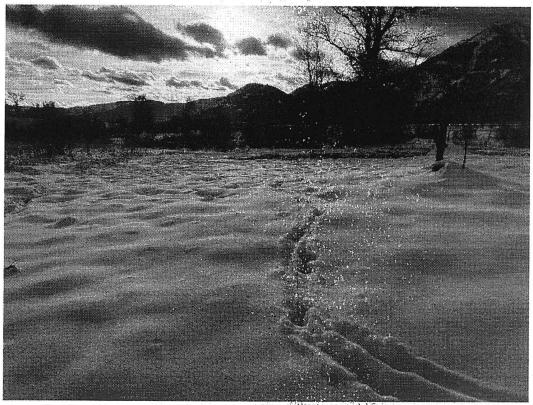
Photo Point 5. View southwest of location of future Geodome facilities, sewer line pipe risers on right (November 16, 2022).
